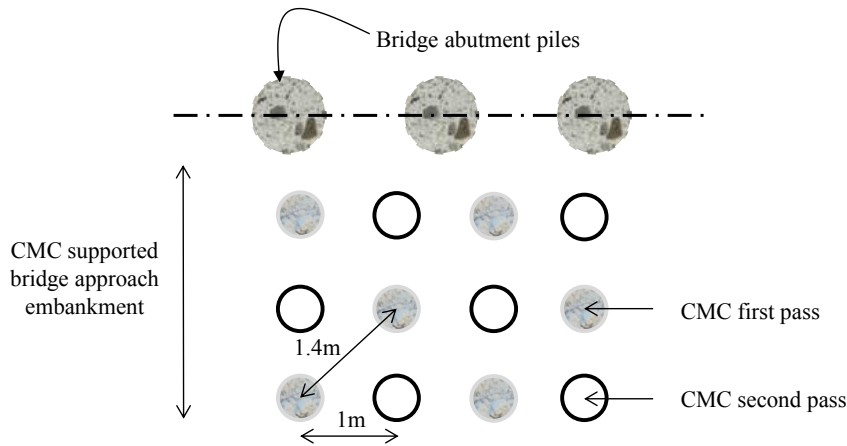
Modified CMC installation layout (modified after Plomteux et al. 2004)
